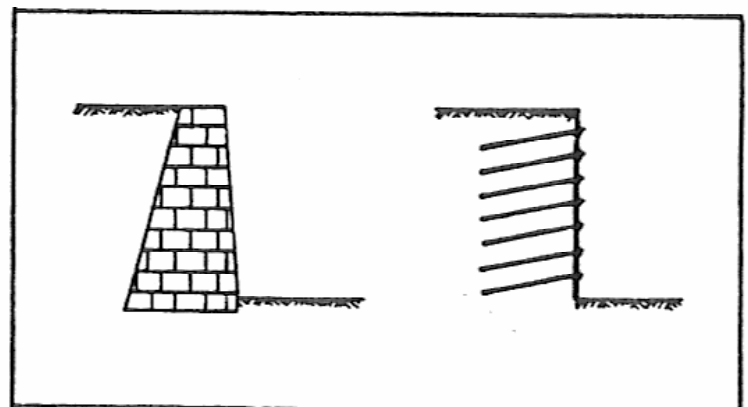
The Analogy Between a Gravity Wall and a Soil Nailed Structure (Stocker et al., 1979).
